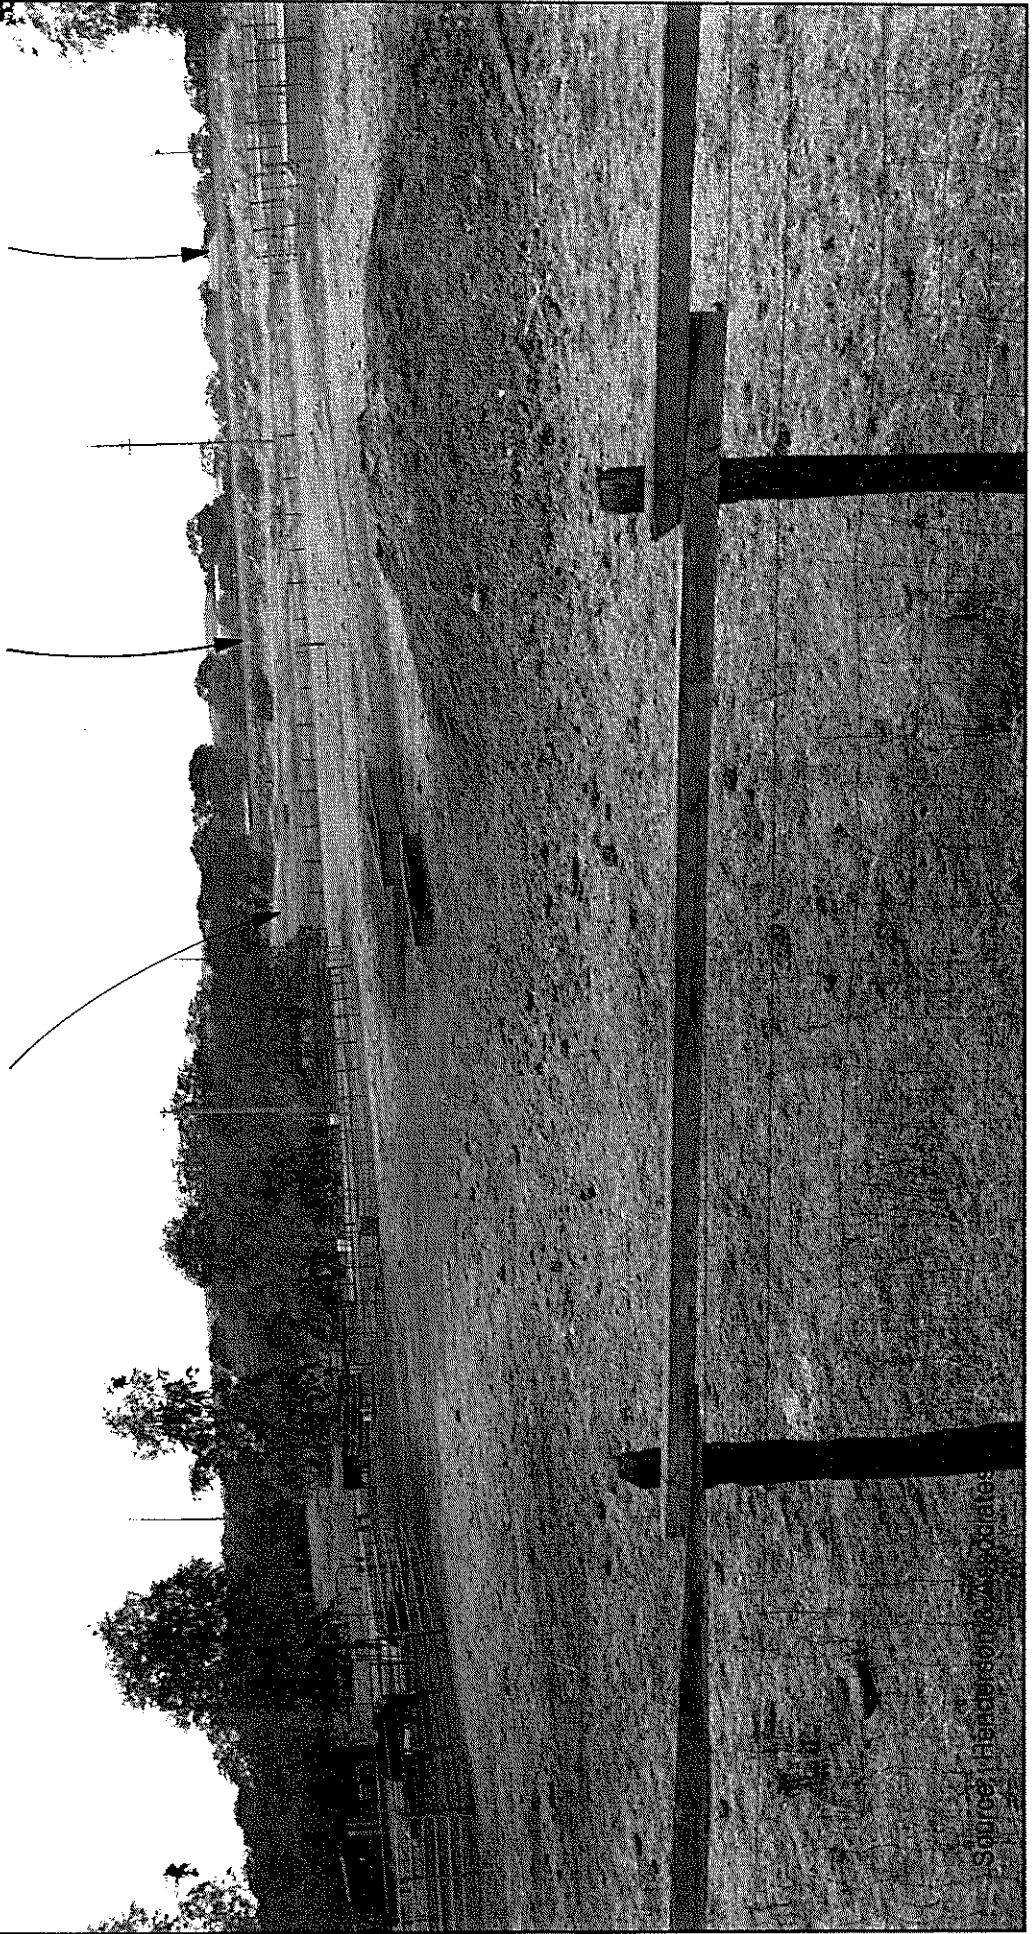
VIEW OF RIDGE DESIGN FROM PHOTO LOCATION #3
